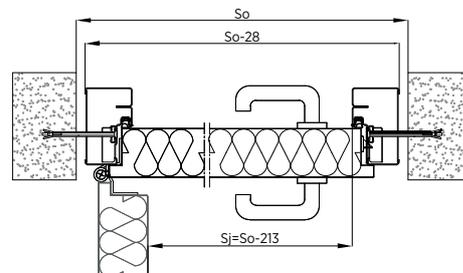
Installation of the single-leaf door to a masonry wall - internal frame with a thermal break - horizontal cross-section
